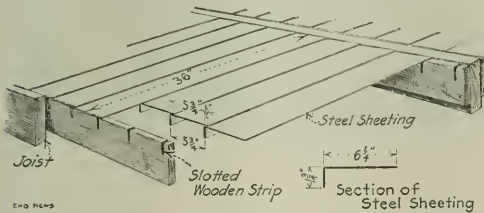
DETAILS OF BLAW STEEL SHEETING FOR CONCRETE WALL AND SLAB FORMS
